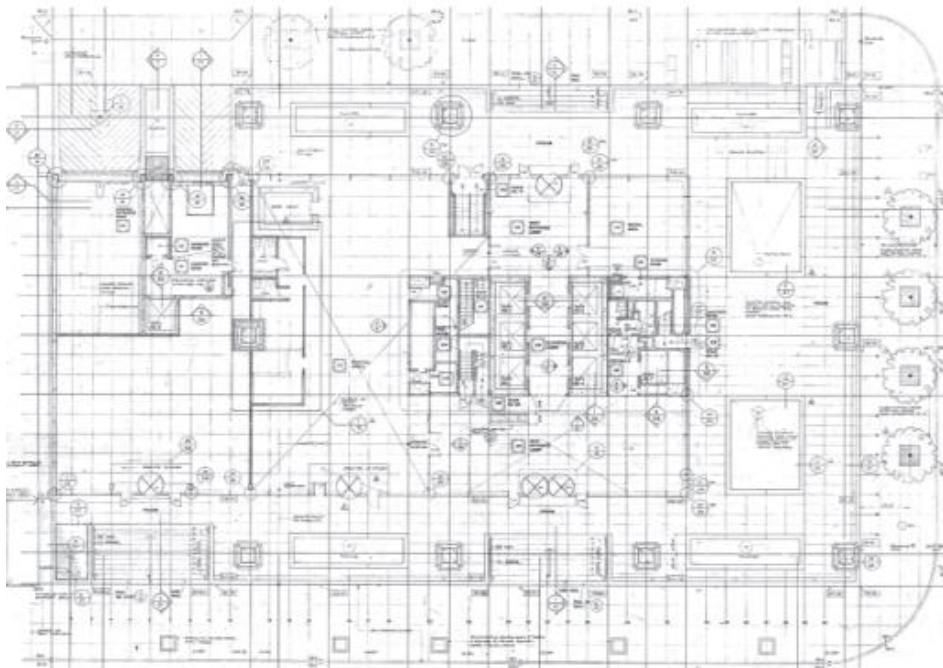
1971 archival drawing of the ground floor plan, including the exterior granite terracing and planters (Building Records)
